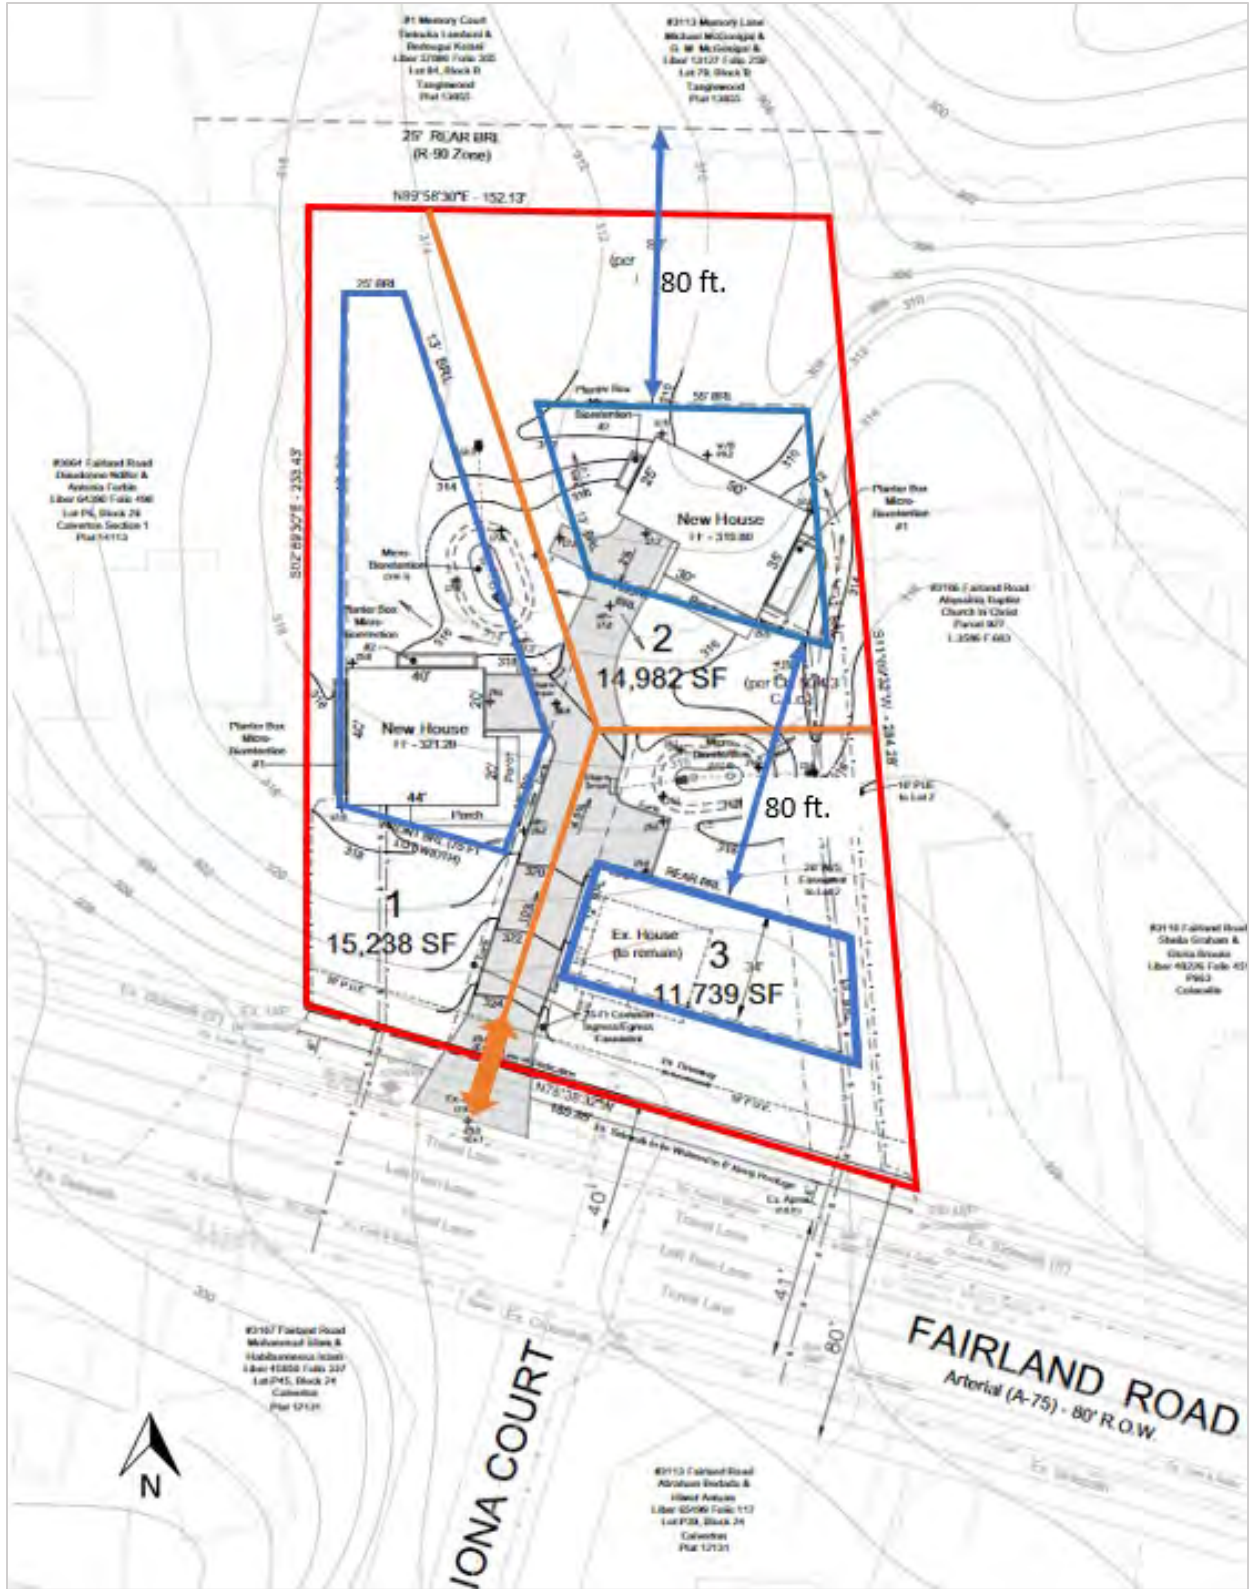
Proposed Administrative Subdivision Plan No. 620230040
